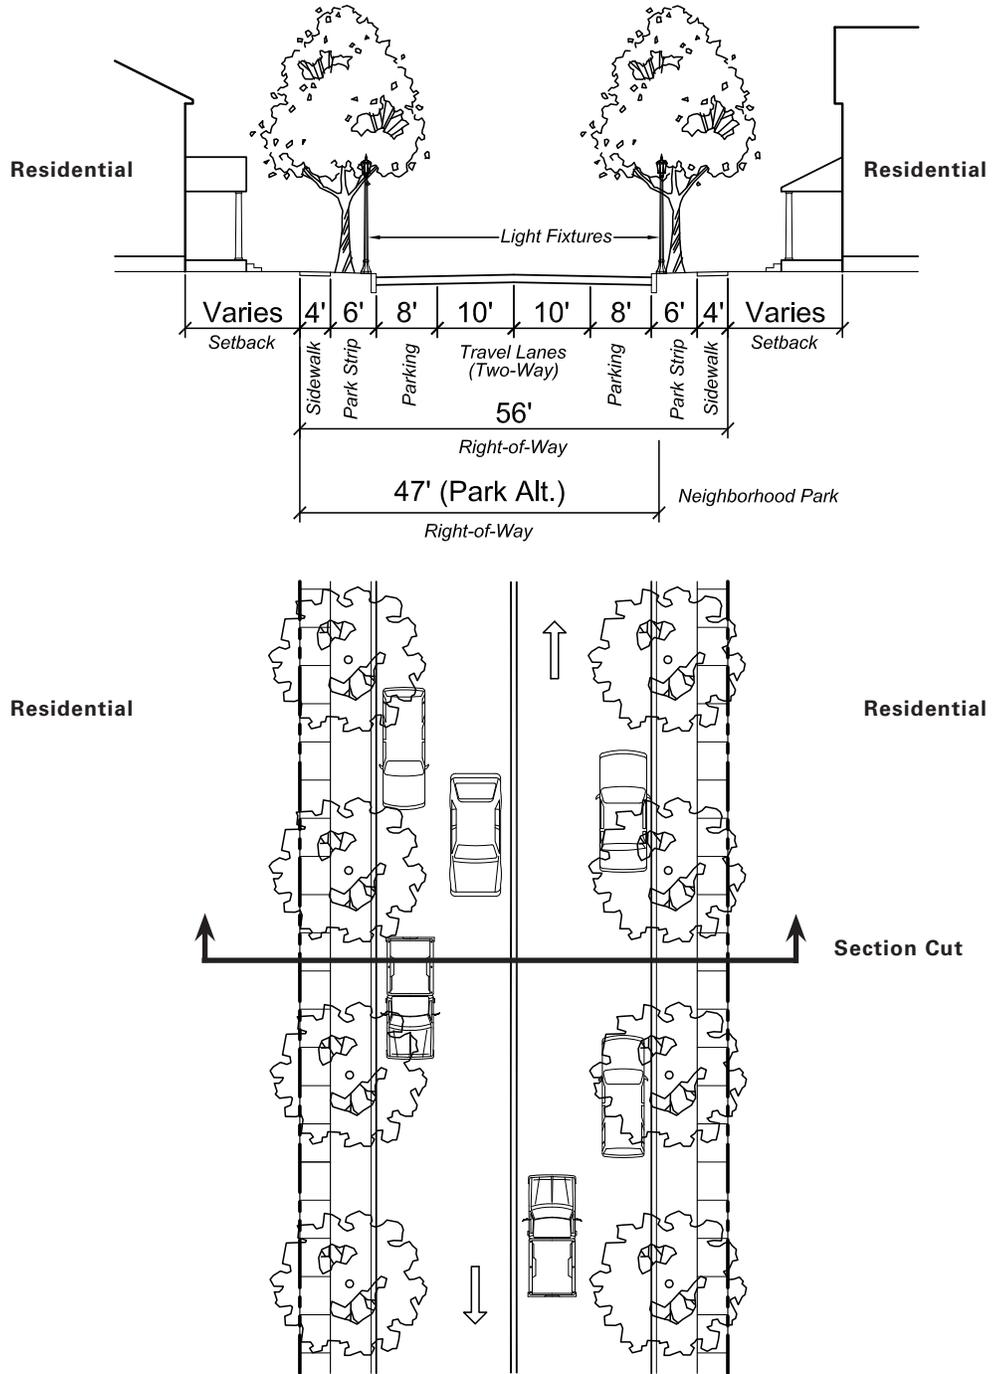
Proposed Section and Plan: Neighborhood Street A
